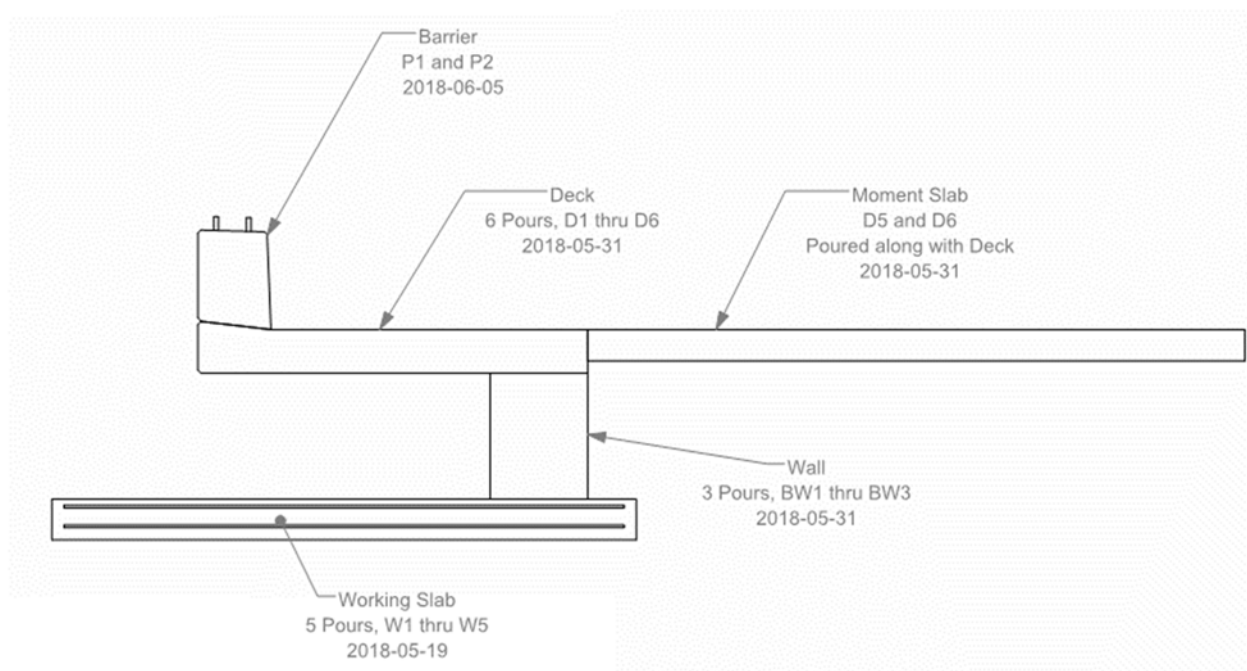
PennDOT PA Bridge Barrier prior to Testing.
